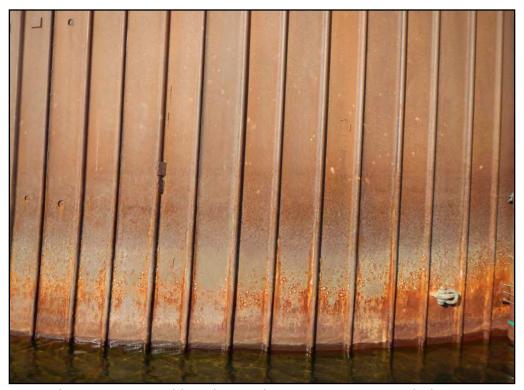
West Gold Dock typical pitting corrosion at splash zone
